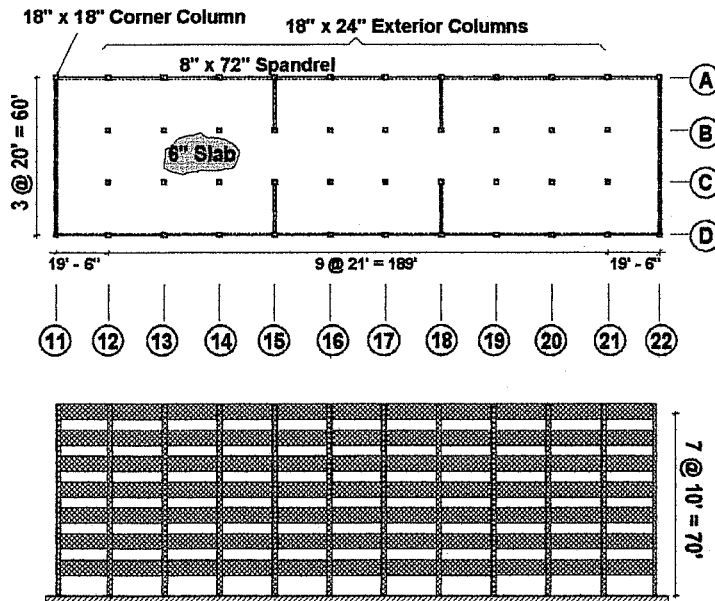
Plan view and longitudinal elevation of the 7-story building.
